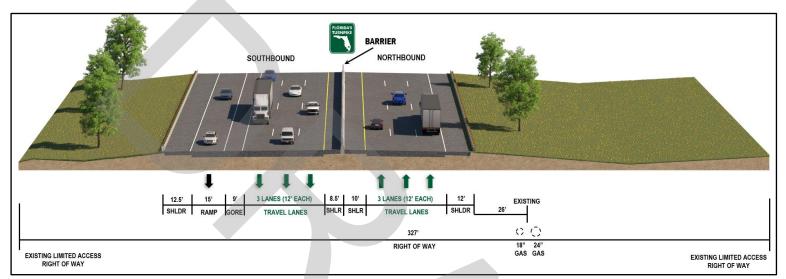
Florida's Turnpike Existing Roadway Section between Wiles Road and Sawgrass Expressway
